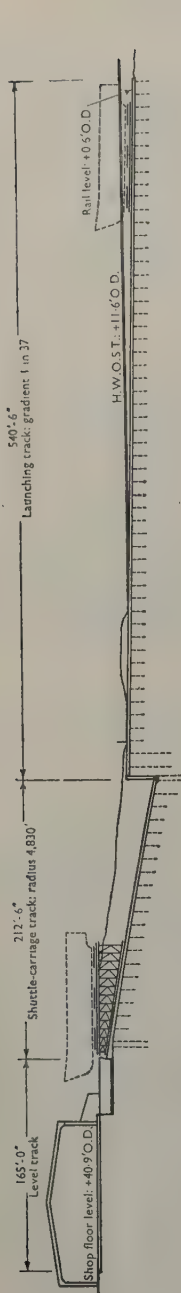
OUTLINE ELEVATION OF SLIPWAY
